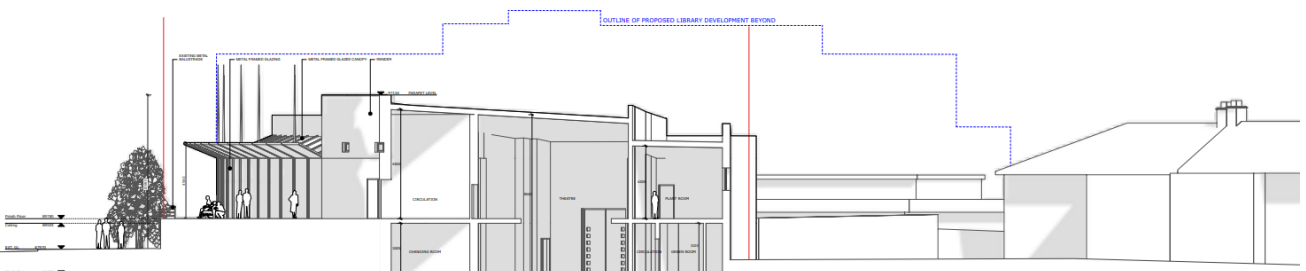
Existing Sections, Riverbank Arts Centre front entrance (Source: Studio Red Architects)
